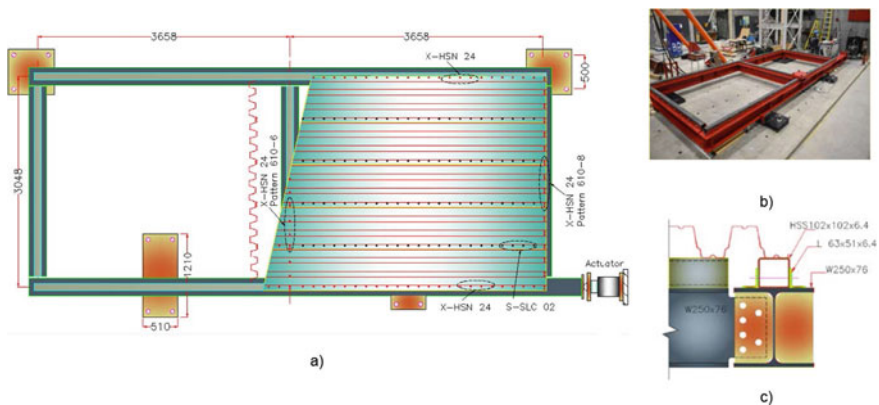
Test setup: a schematic of the test setup and layout of connections, b photo of the test setup, c edge support (Typ.)
